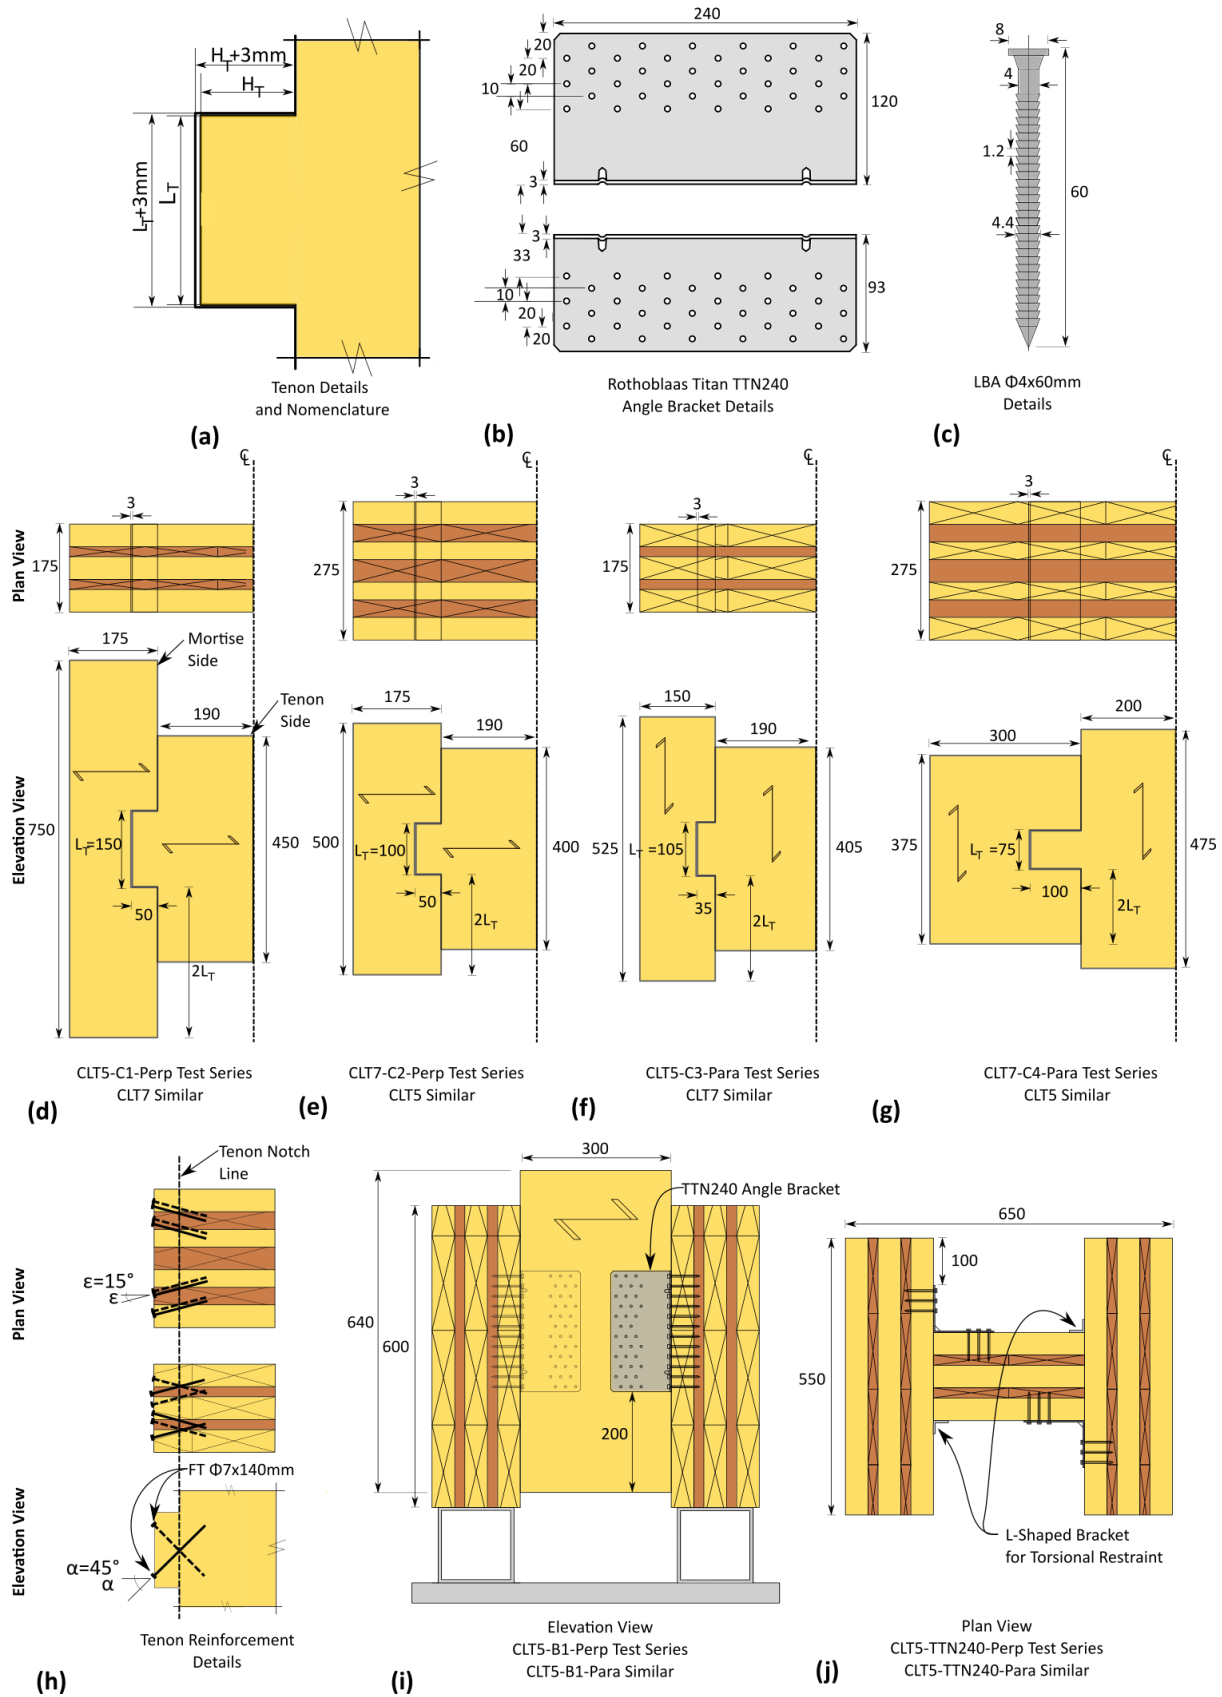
(a) tenon details, (b) angle bracket details, (c) nail details, (d) C1 test series, (e) C2 test series, (f) C3 test series, (g) C4 test series, (h) tenon reinforcement details, (i) elevation view angle bracket test series, (j) plan view angle bracket test series
